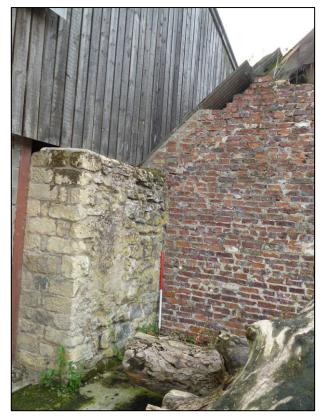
'To-be-demolished' building, east side of north gable, looking SE (photo 1/573).
